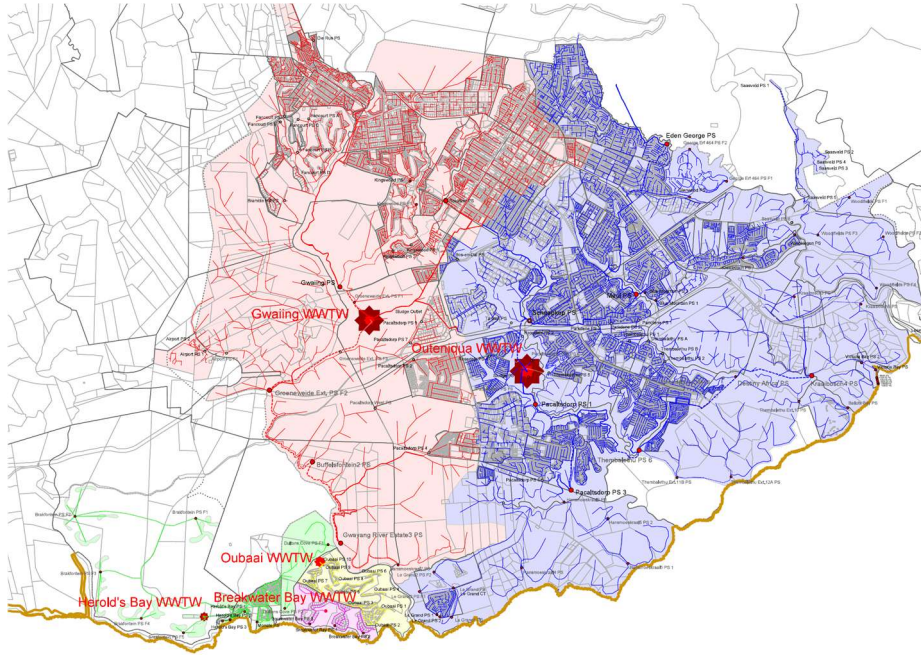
Gwaing Catchment Drainage Area (Master Planning of George Sewer Plan, 2022)
